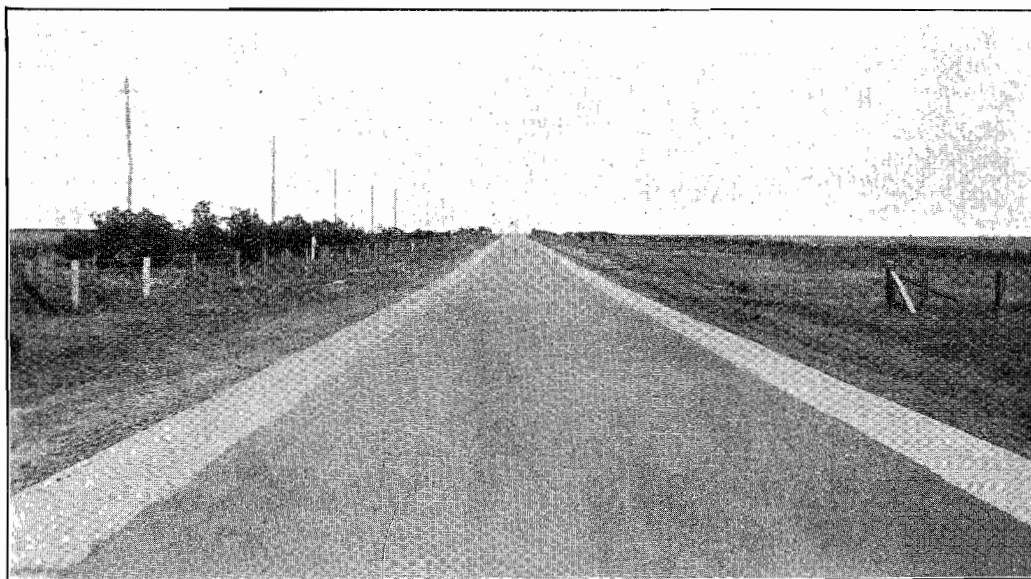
Prince's Highway West, showing New Plantations on Calder Memorial Avenue.
